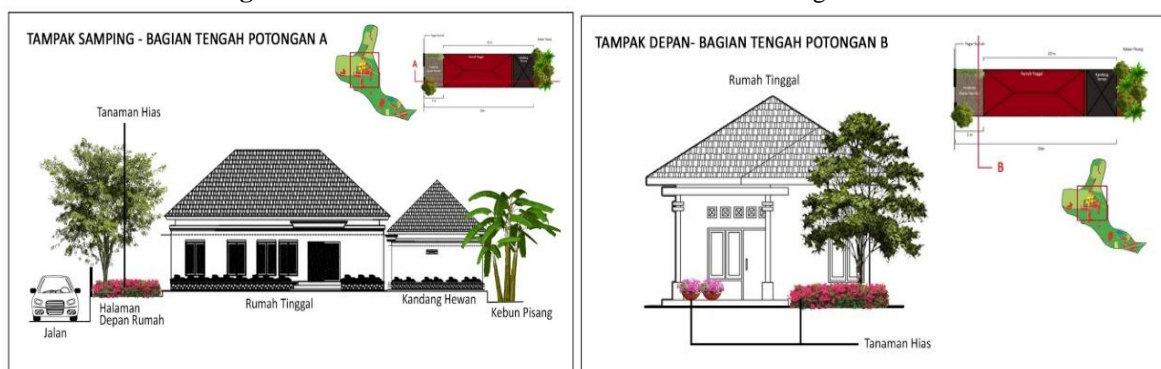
Settlement Pattern Model for the Central Area of Sendang Biru: (left) Side Section View; (right) Front Section View
